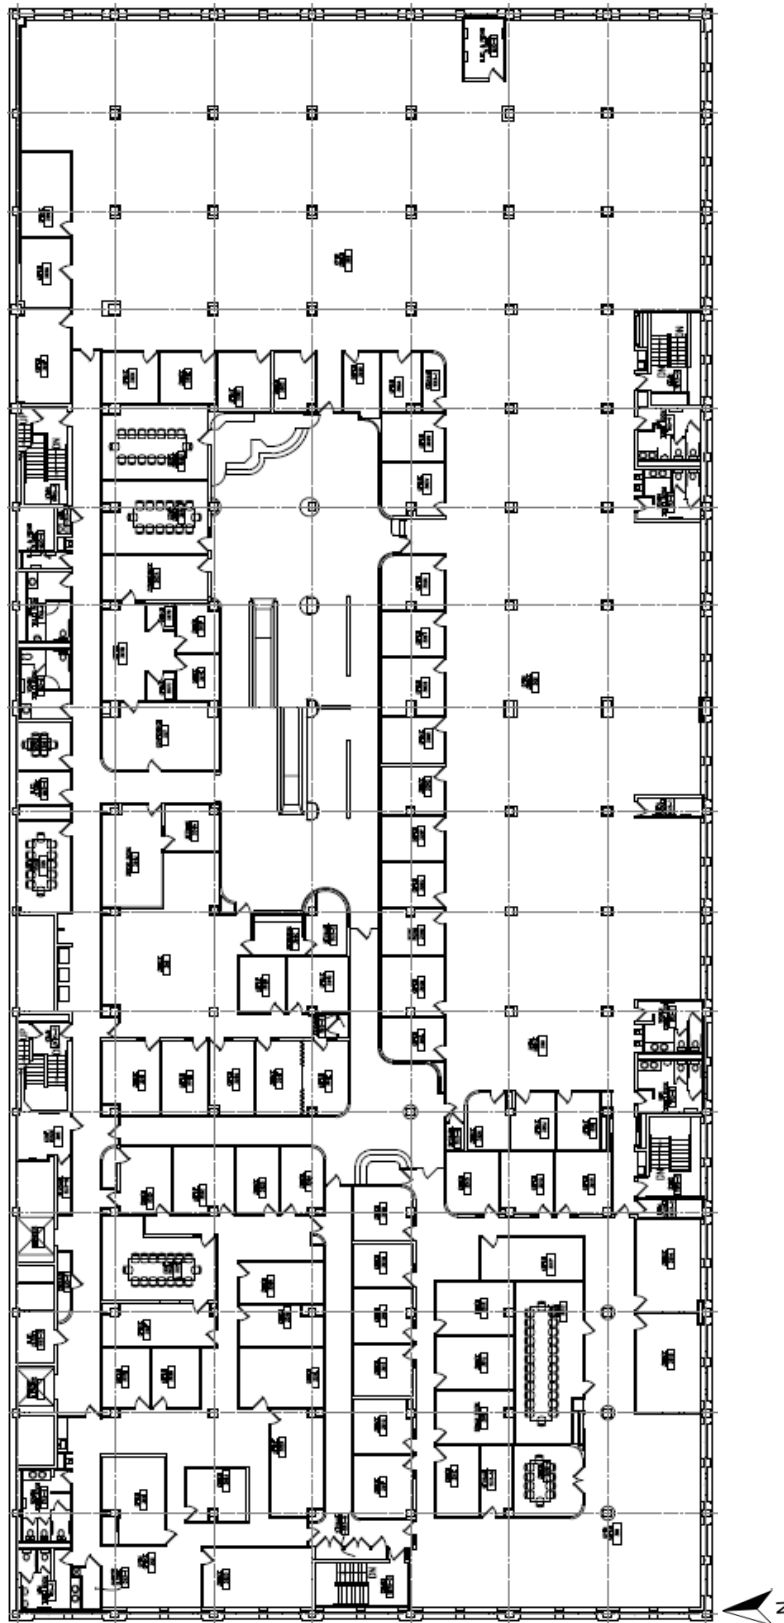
Current Third Floor Plan (Quorum Architects). Not to Scale.
